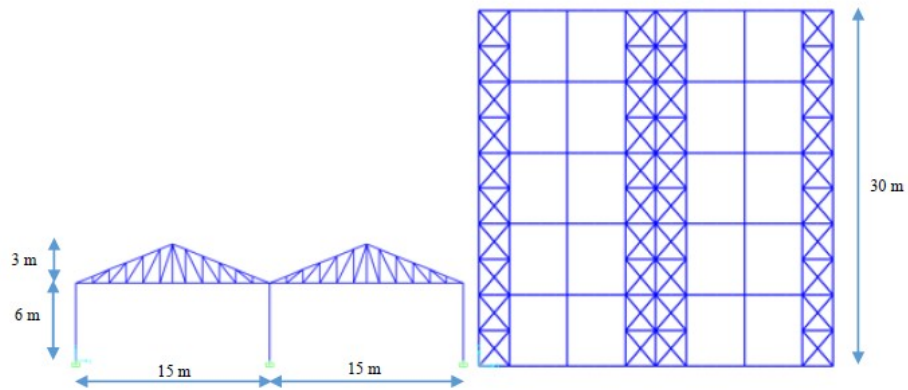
Elevation & Plan View of Multiple Bay Structure of 30 m Span
